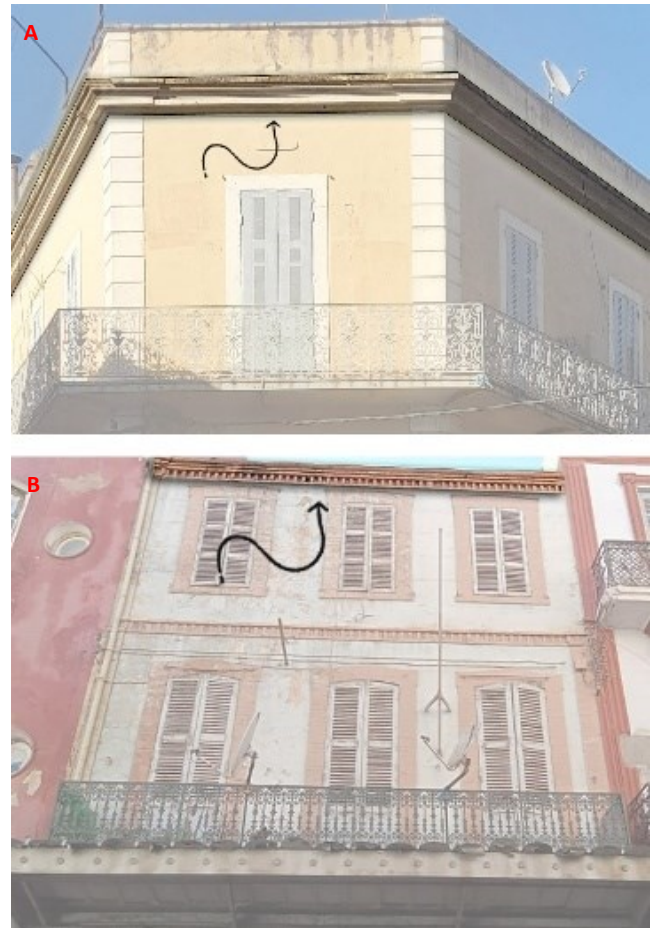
Examples of a cornice that is a decorative architectural element typically found at the top of a building or structure, where the wall meets the roof. It projects outward from the wall, creating a visually pleasing transition between the wall and the roofline. A) A simple cornice; B) A dentiled cornice. (Source: Authors, 2024)
